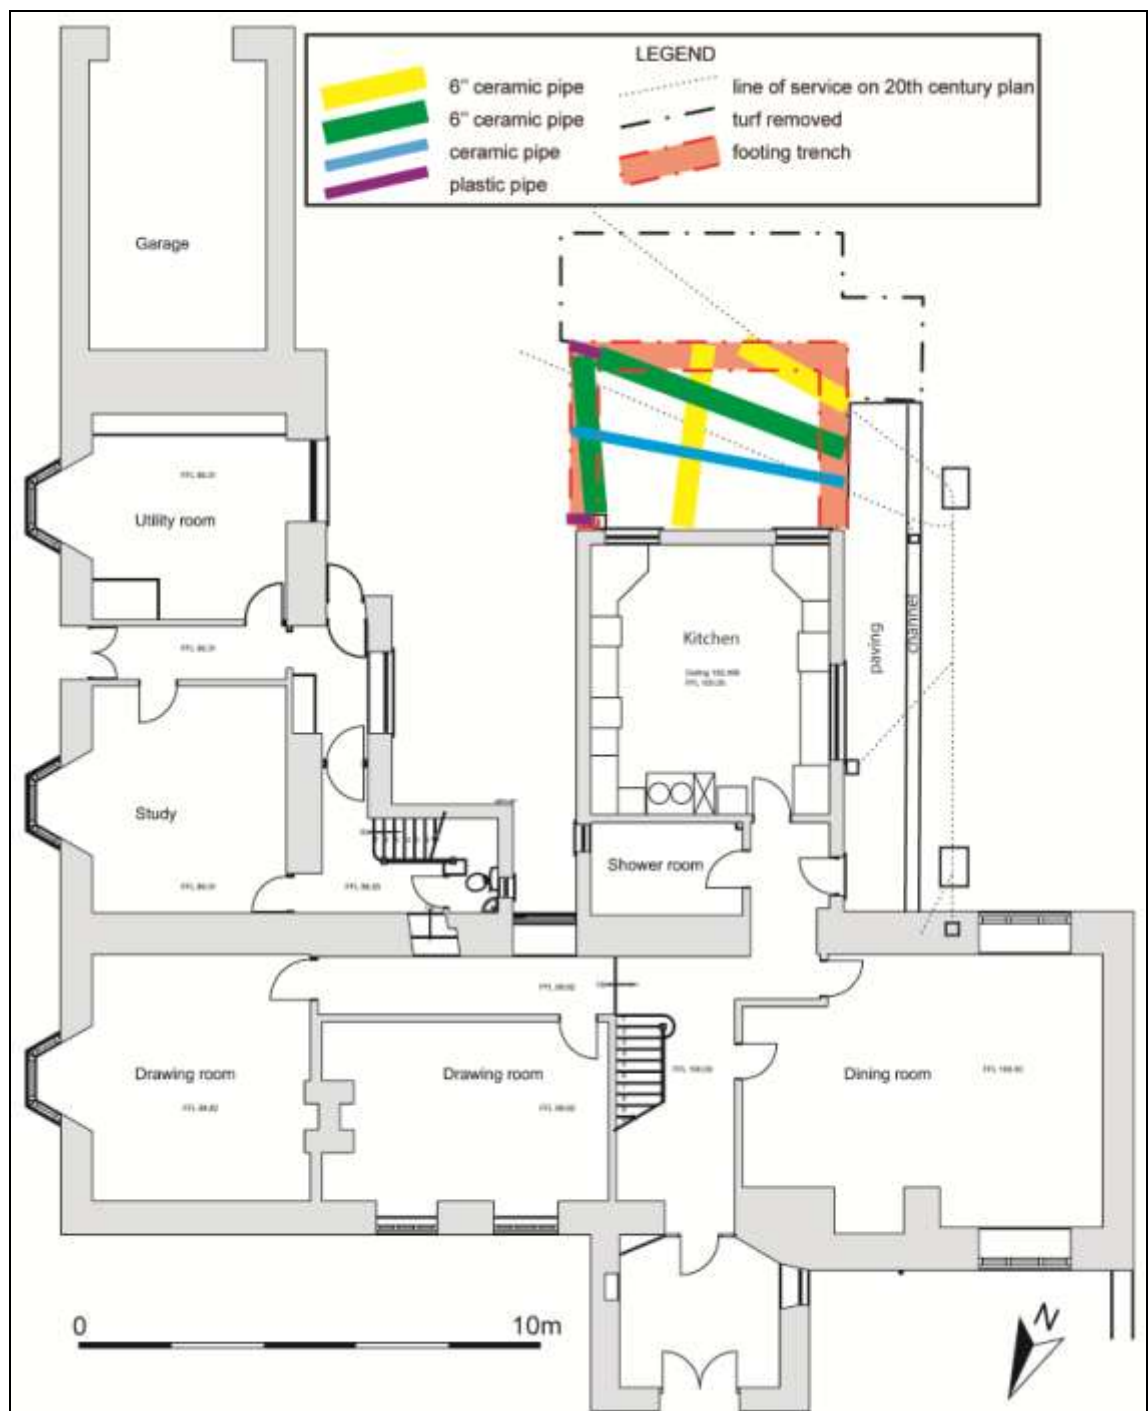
Site plan showing excavated areas, water pipes and water pipes marked on early 20th century plan.
